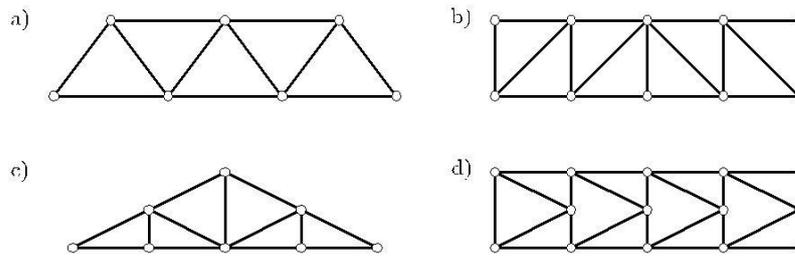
a) V-truss, b) N-truss, c) Roof truss, d) K-truss.
